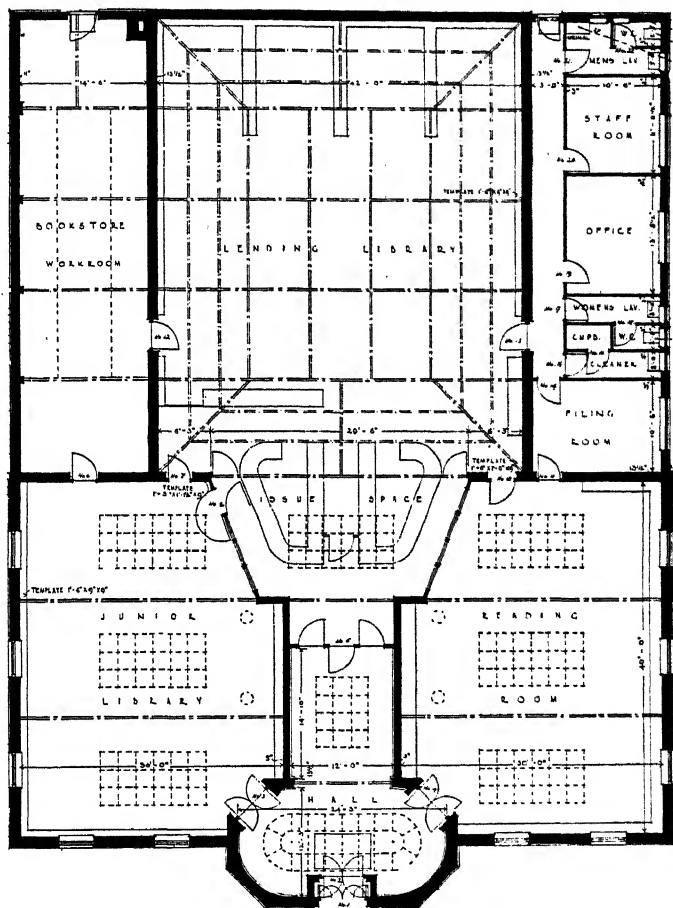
North Watford Branch Library—Plan showing all Departments Controlled from a Central Counter (Section 185).
